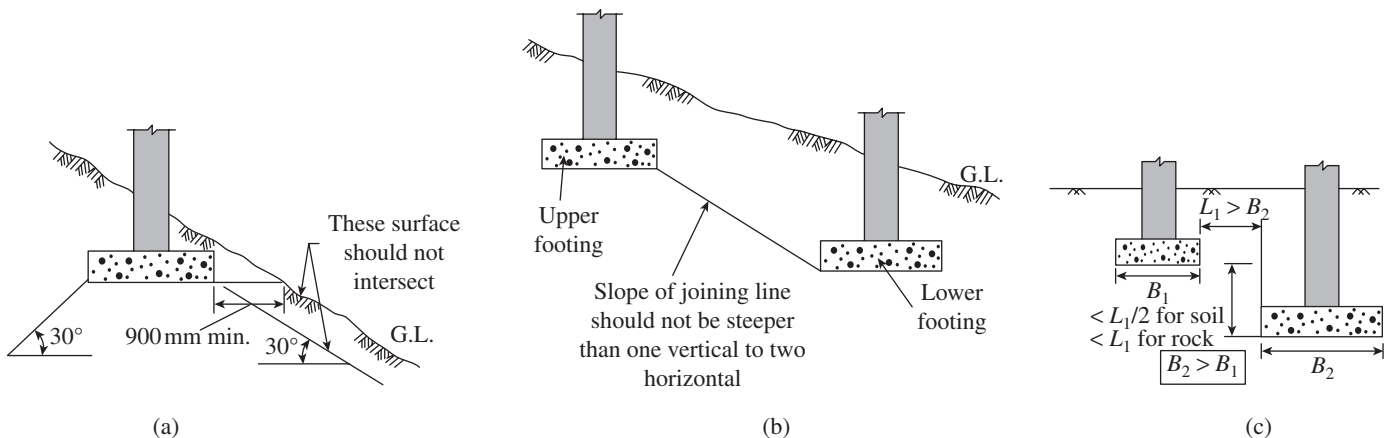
Footing depth in sloping ground or when they are at different levels (a) Footing on sloping ground (b) Footing in granular or clayey soil (c) Footing at two levels
